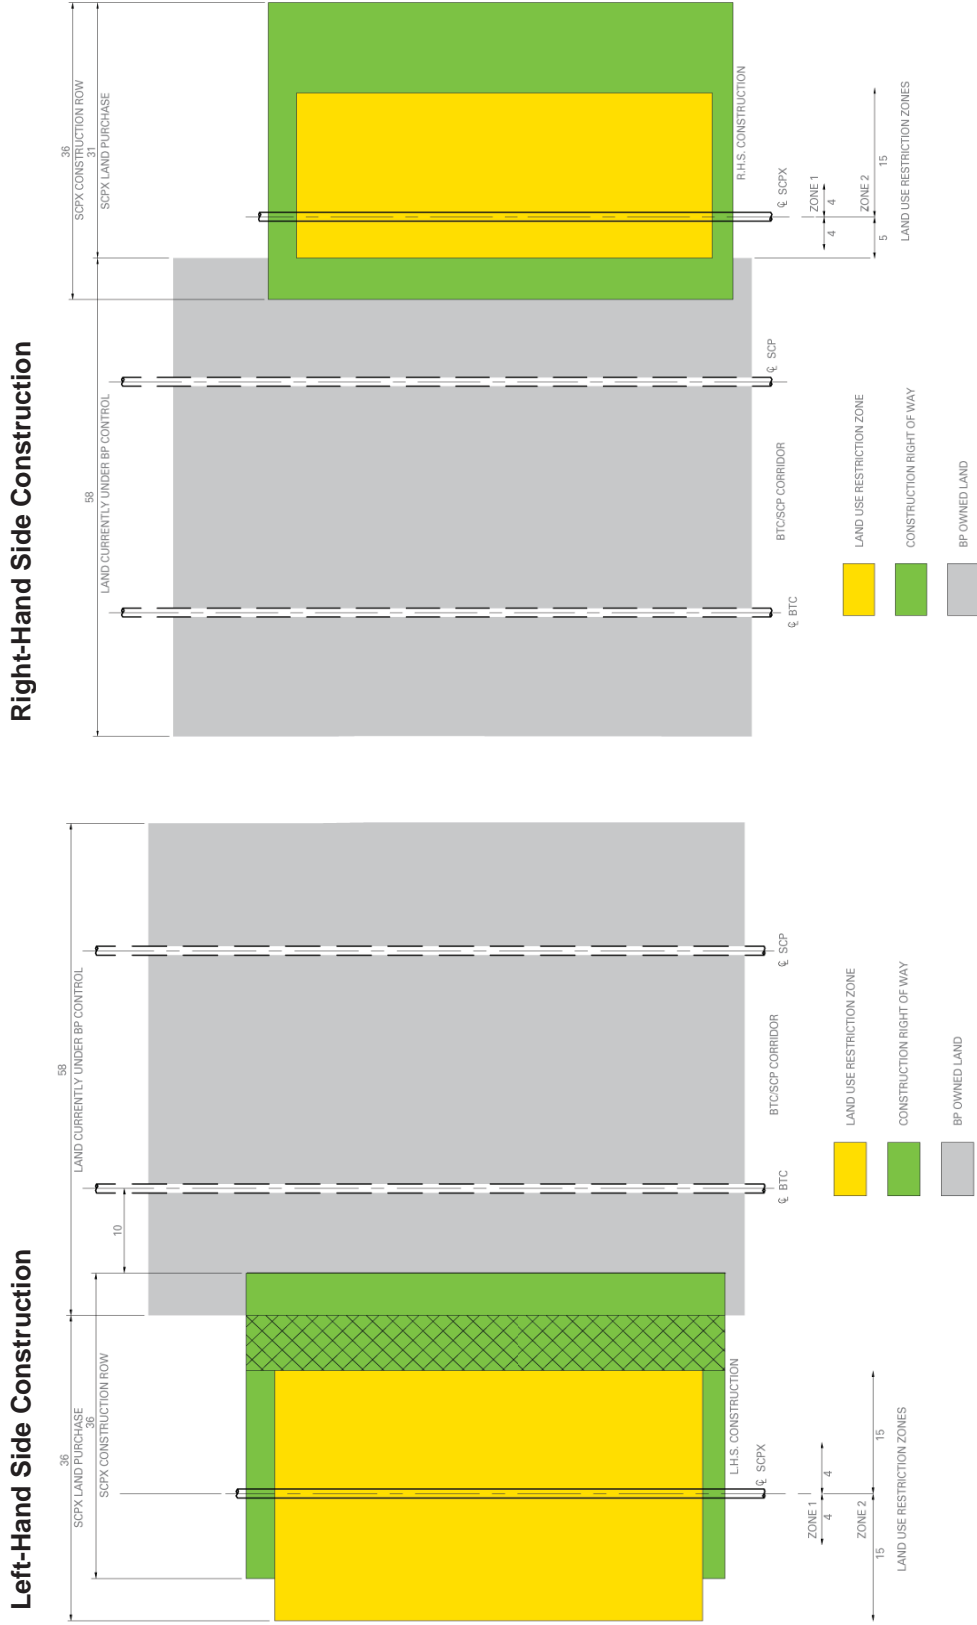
Layout of Construction Corridor and Restriction Zones 1 and 2 – SCPX Parallel to BTC/SCP
